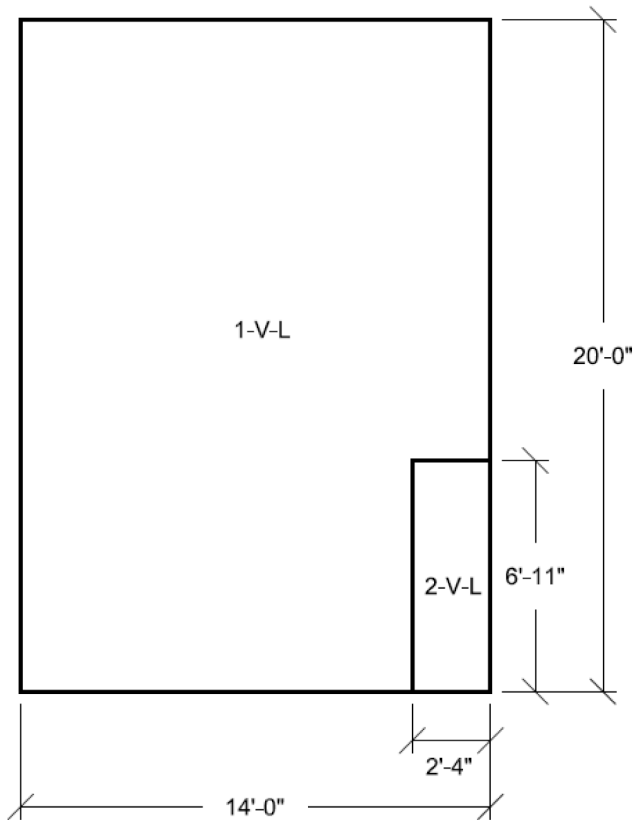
H.6-180A DGFOV Wall 10 Looking From Outside Vertical Reinforcement Zones Far Side Face
